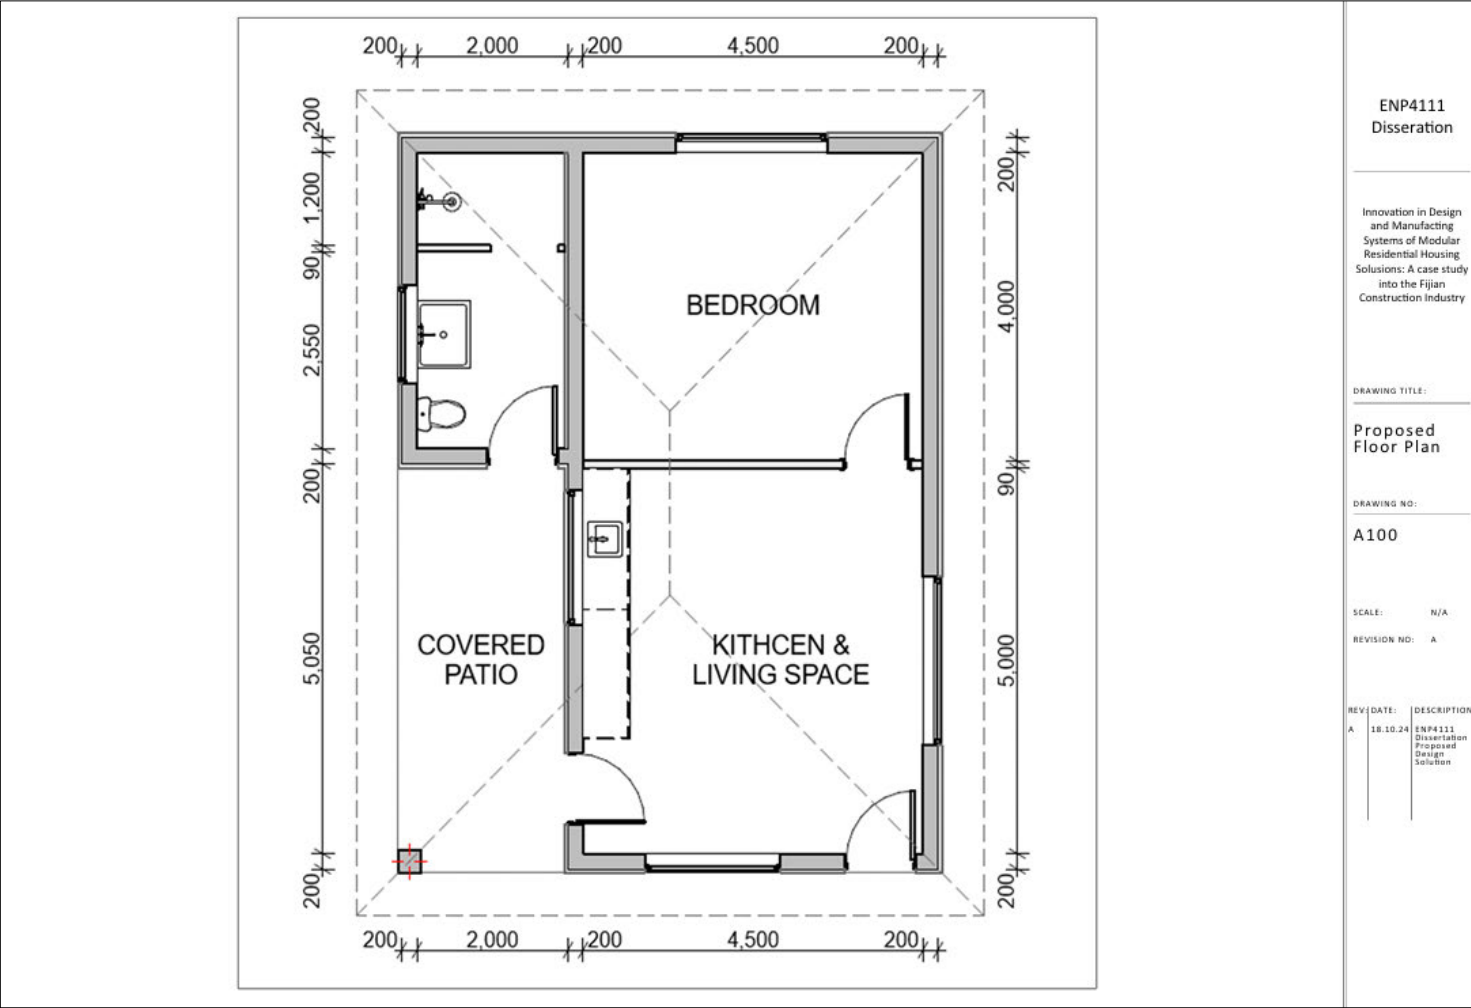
Proposed Modular Construction Floor Plan (Battersby, 2024)
